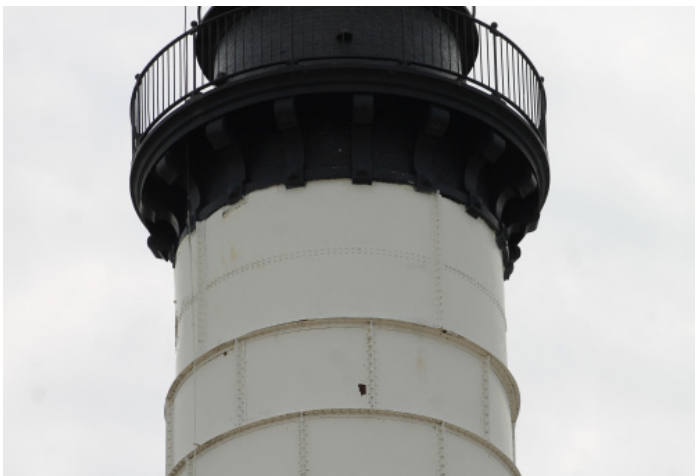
D-269 Differences in detailing of metal cladding at top of tower to typical sections below.
